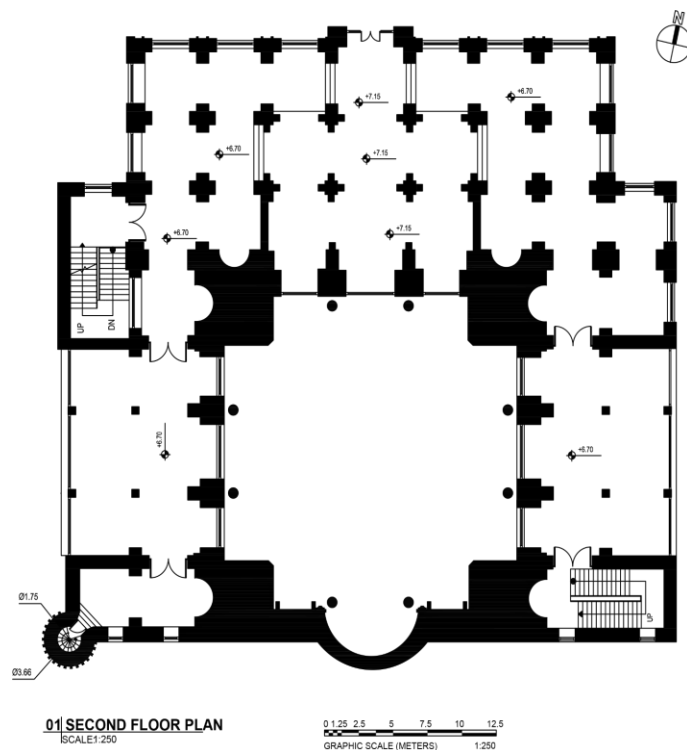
(Second Floor plan of Pol Kheshti Mosque) [Source: Authors]
